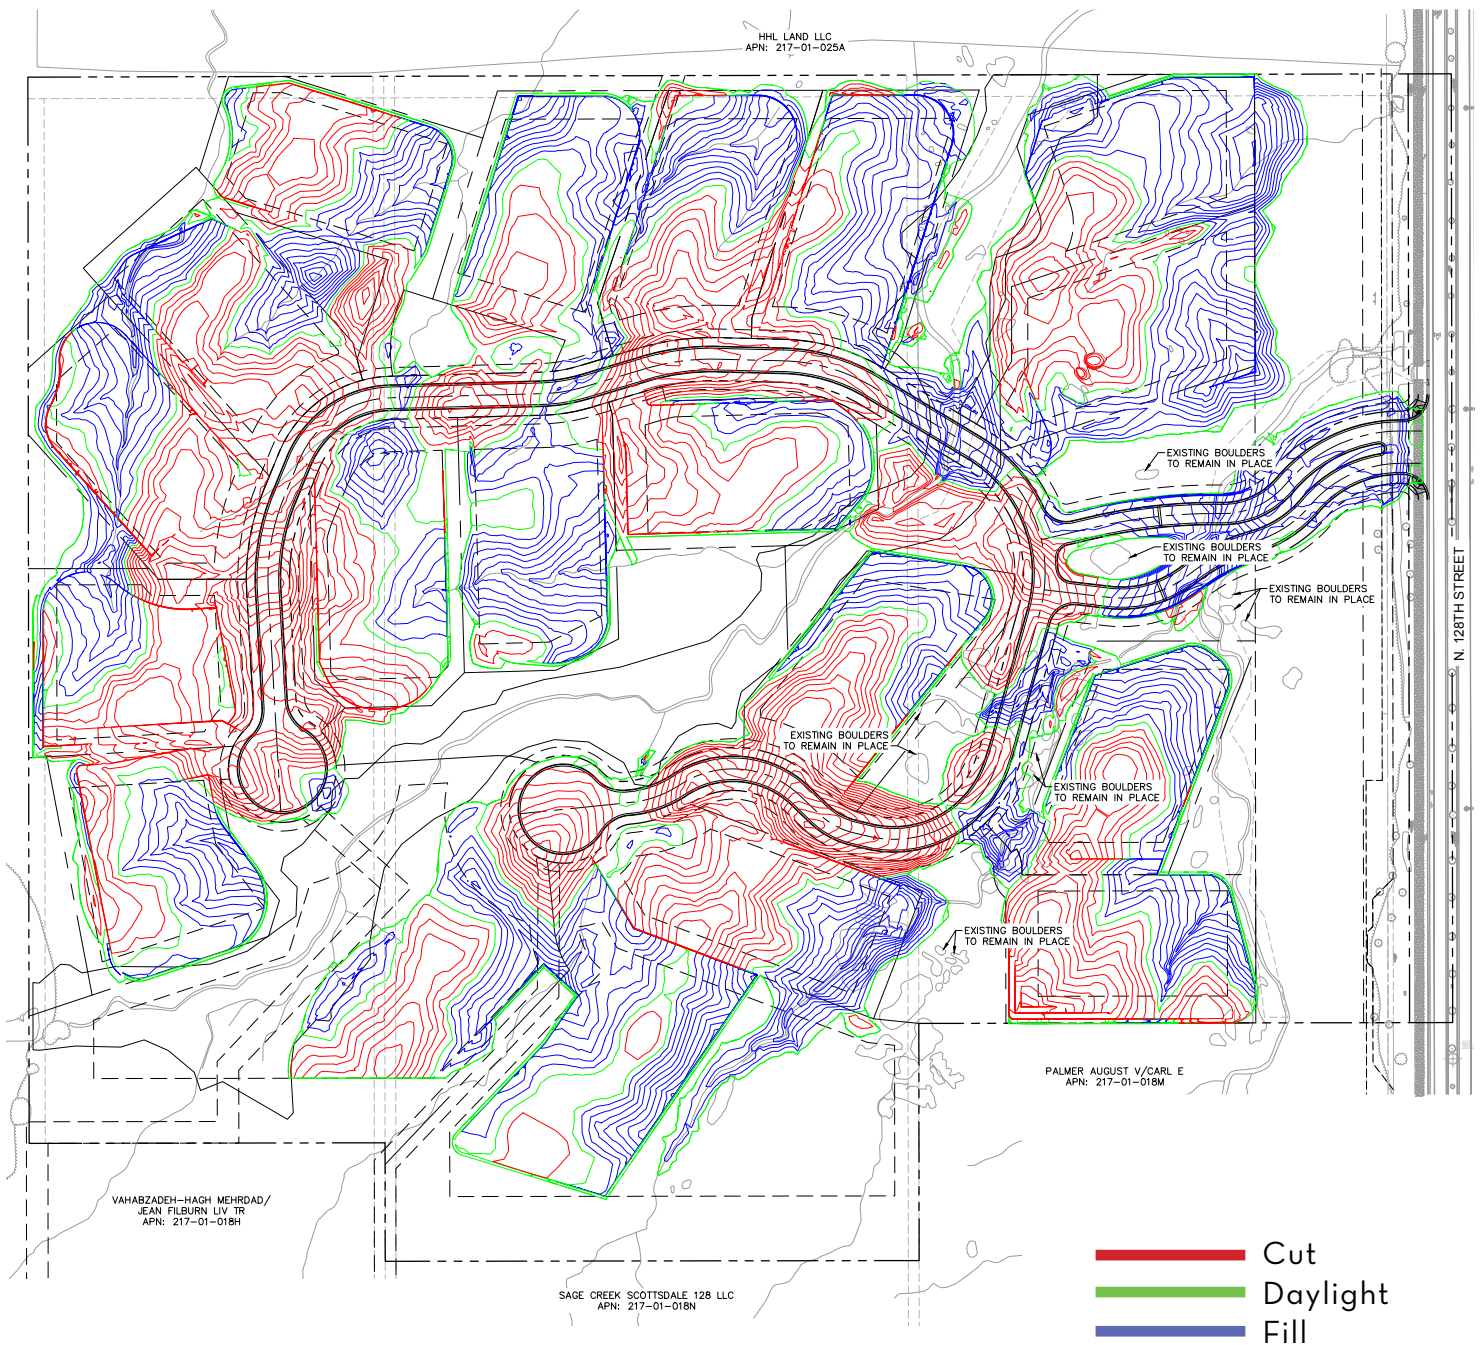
PRELIMINARY CUT AND FILL PLAN
